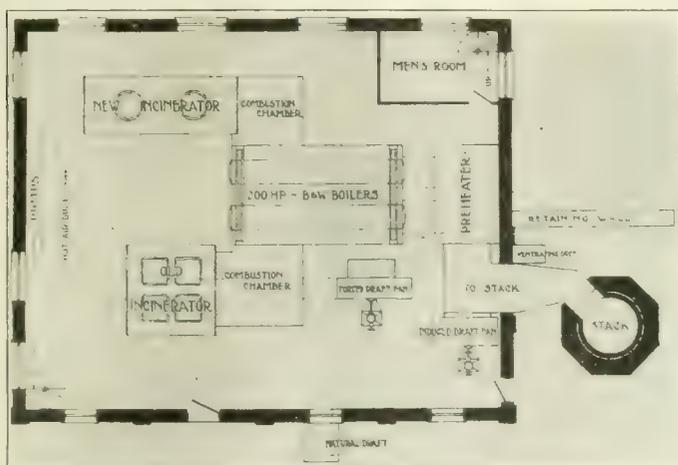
Plan of Operating Floor of New Municipal Refuse Incinerating Plant at Regina, Saskatchewan.
